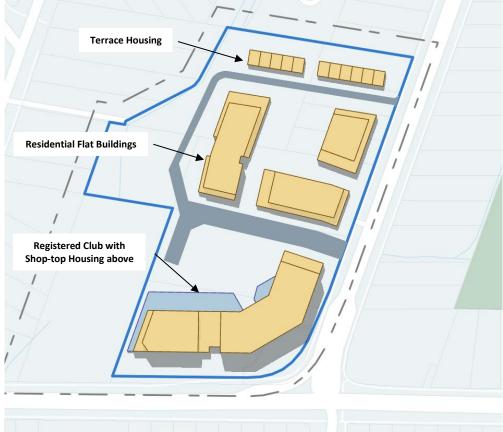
Site Plan showing the indicative concept development scheme (current scheme).
